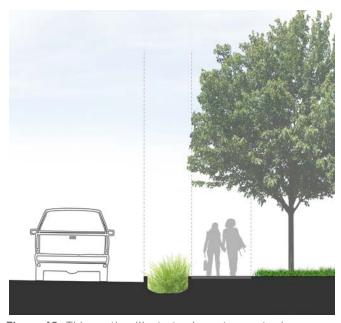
This section illustrates how stormwater is infiltrated in vegetated bioswales between the street and sidewalk.
